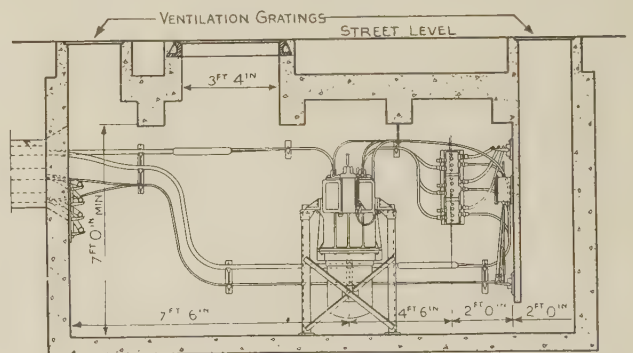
SECTIONAL ELEVATION OF TRANSFORMER VAULT
